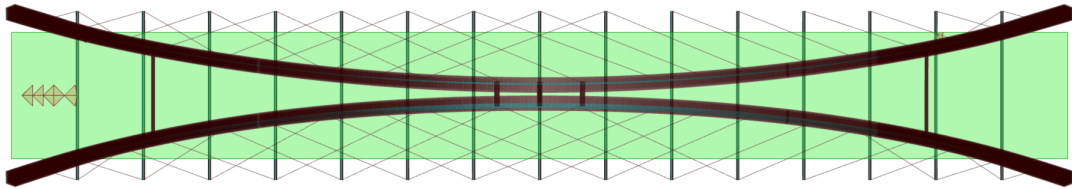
100 m span with three splices: Skew load. The crossbeams closest to the deck supports are of constant height 550 mm. Elements exceeding the Tsai Wu criterion are marked in a darker shade.
